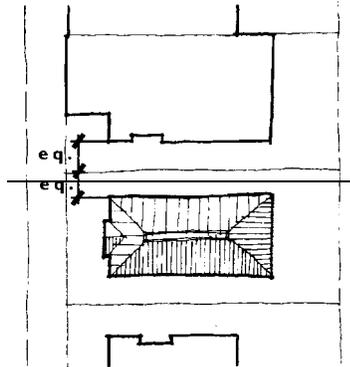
Equal Setbacks Adjacent to Historic Buildings
